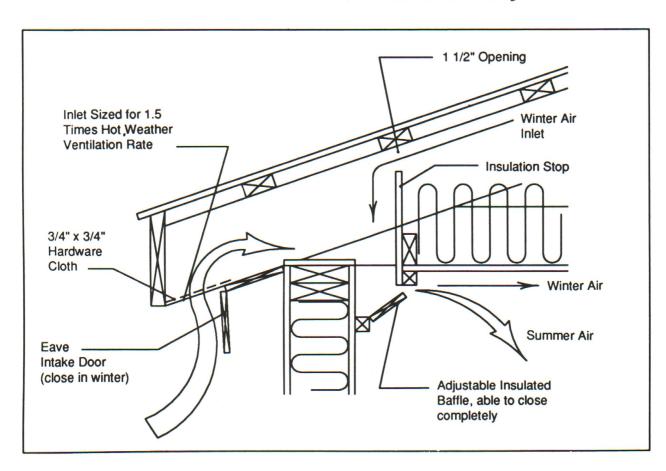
Typical eave and baffled slot intake. Source: Midwest Plan Service, MWPS-32, Mechanical Ventilating Systems Handbook.
